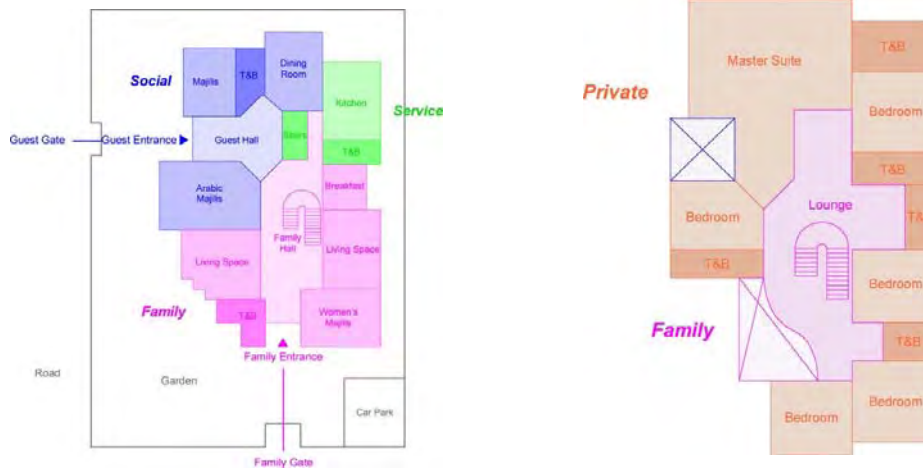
Ground Floor Plan (left) and First Floor Plan (right)
